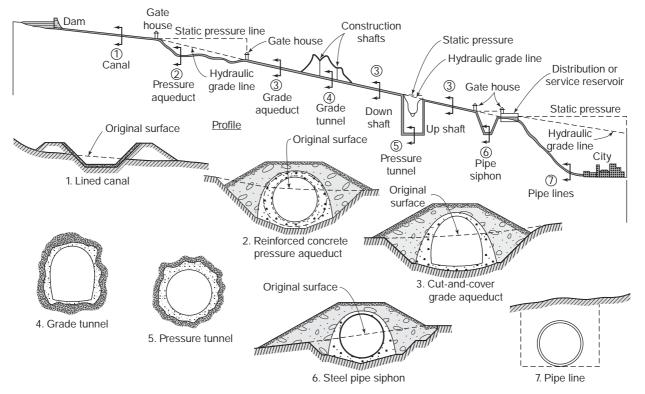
Profile and typical cross-sections of a water supply conduit.
